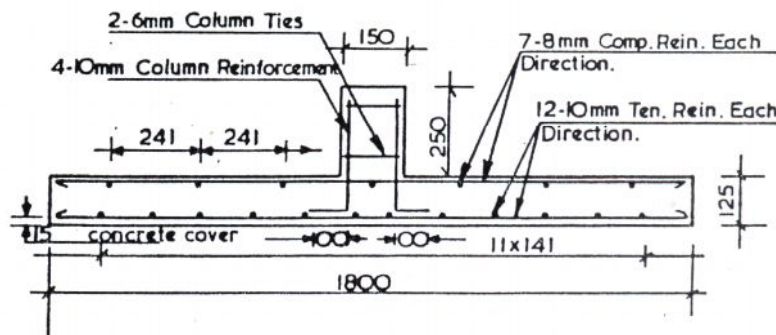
Dimension and detail of slab No.(S-2) [14]
